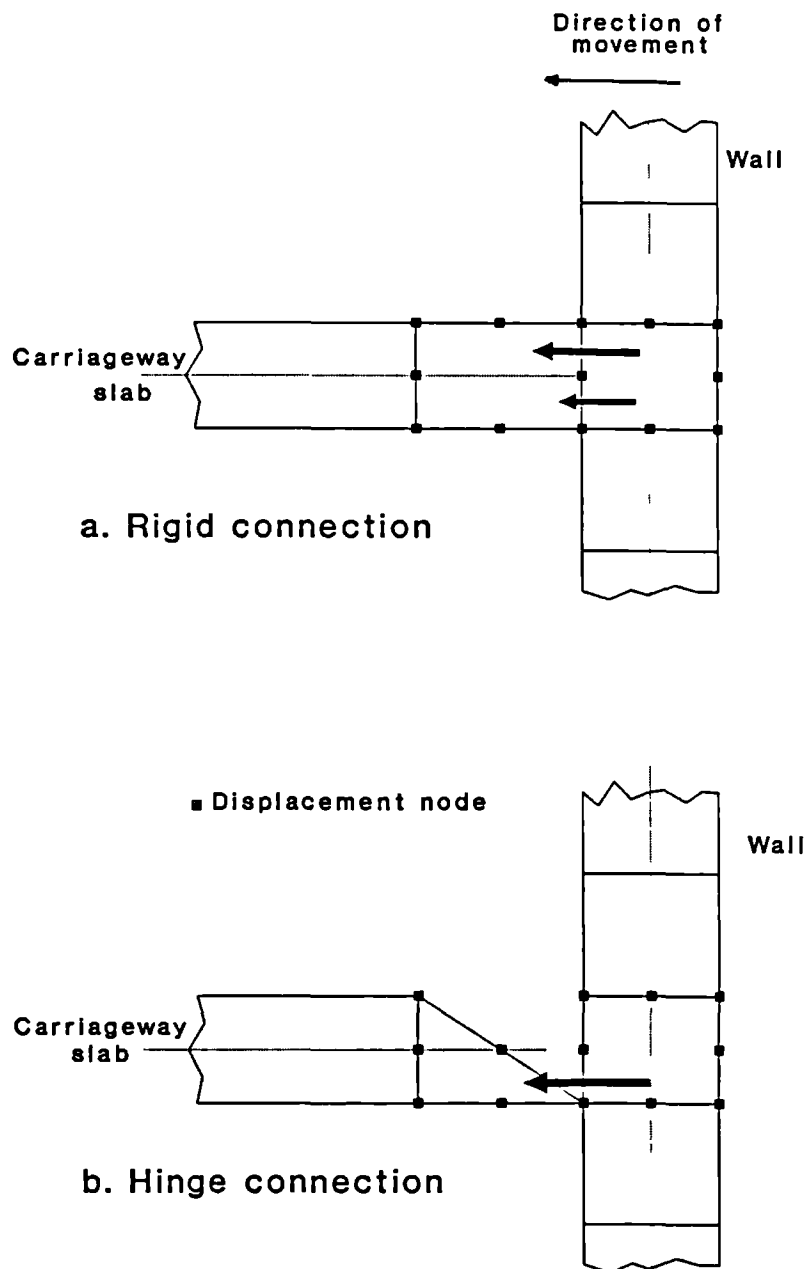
Different connections between the retaining wall and the carriageway slab
